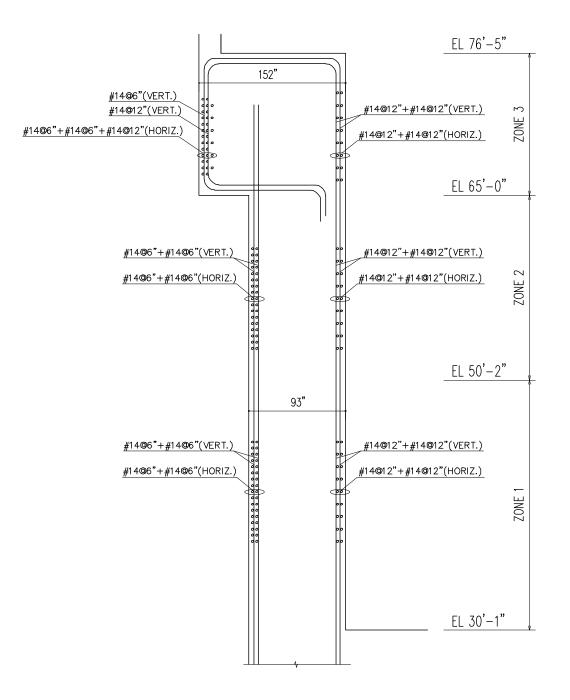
Typical Reinforcement in North Exterior Wall of Spent Fuel Pit – SECTION 3
